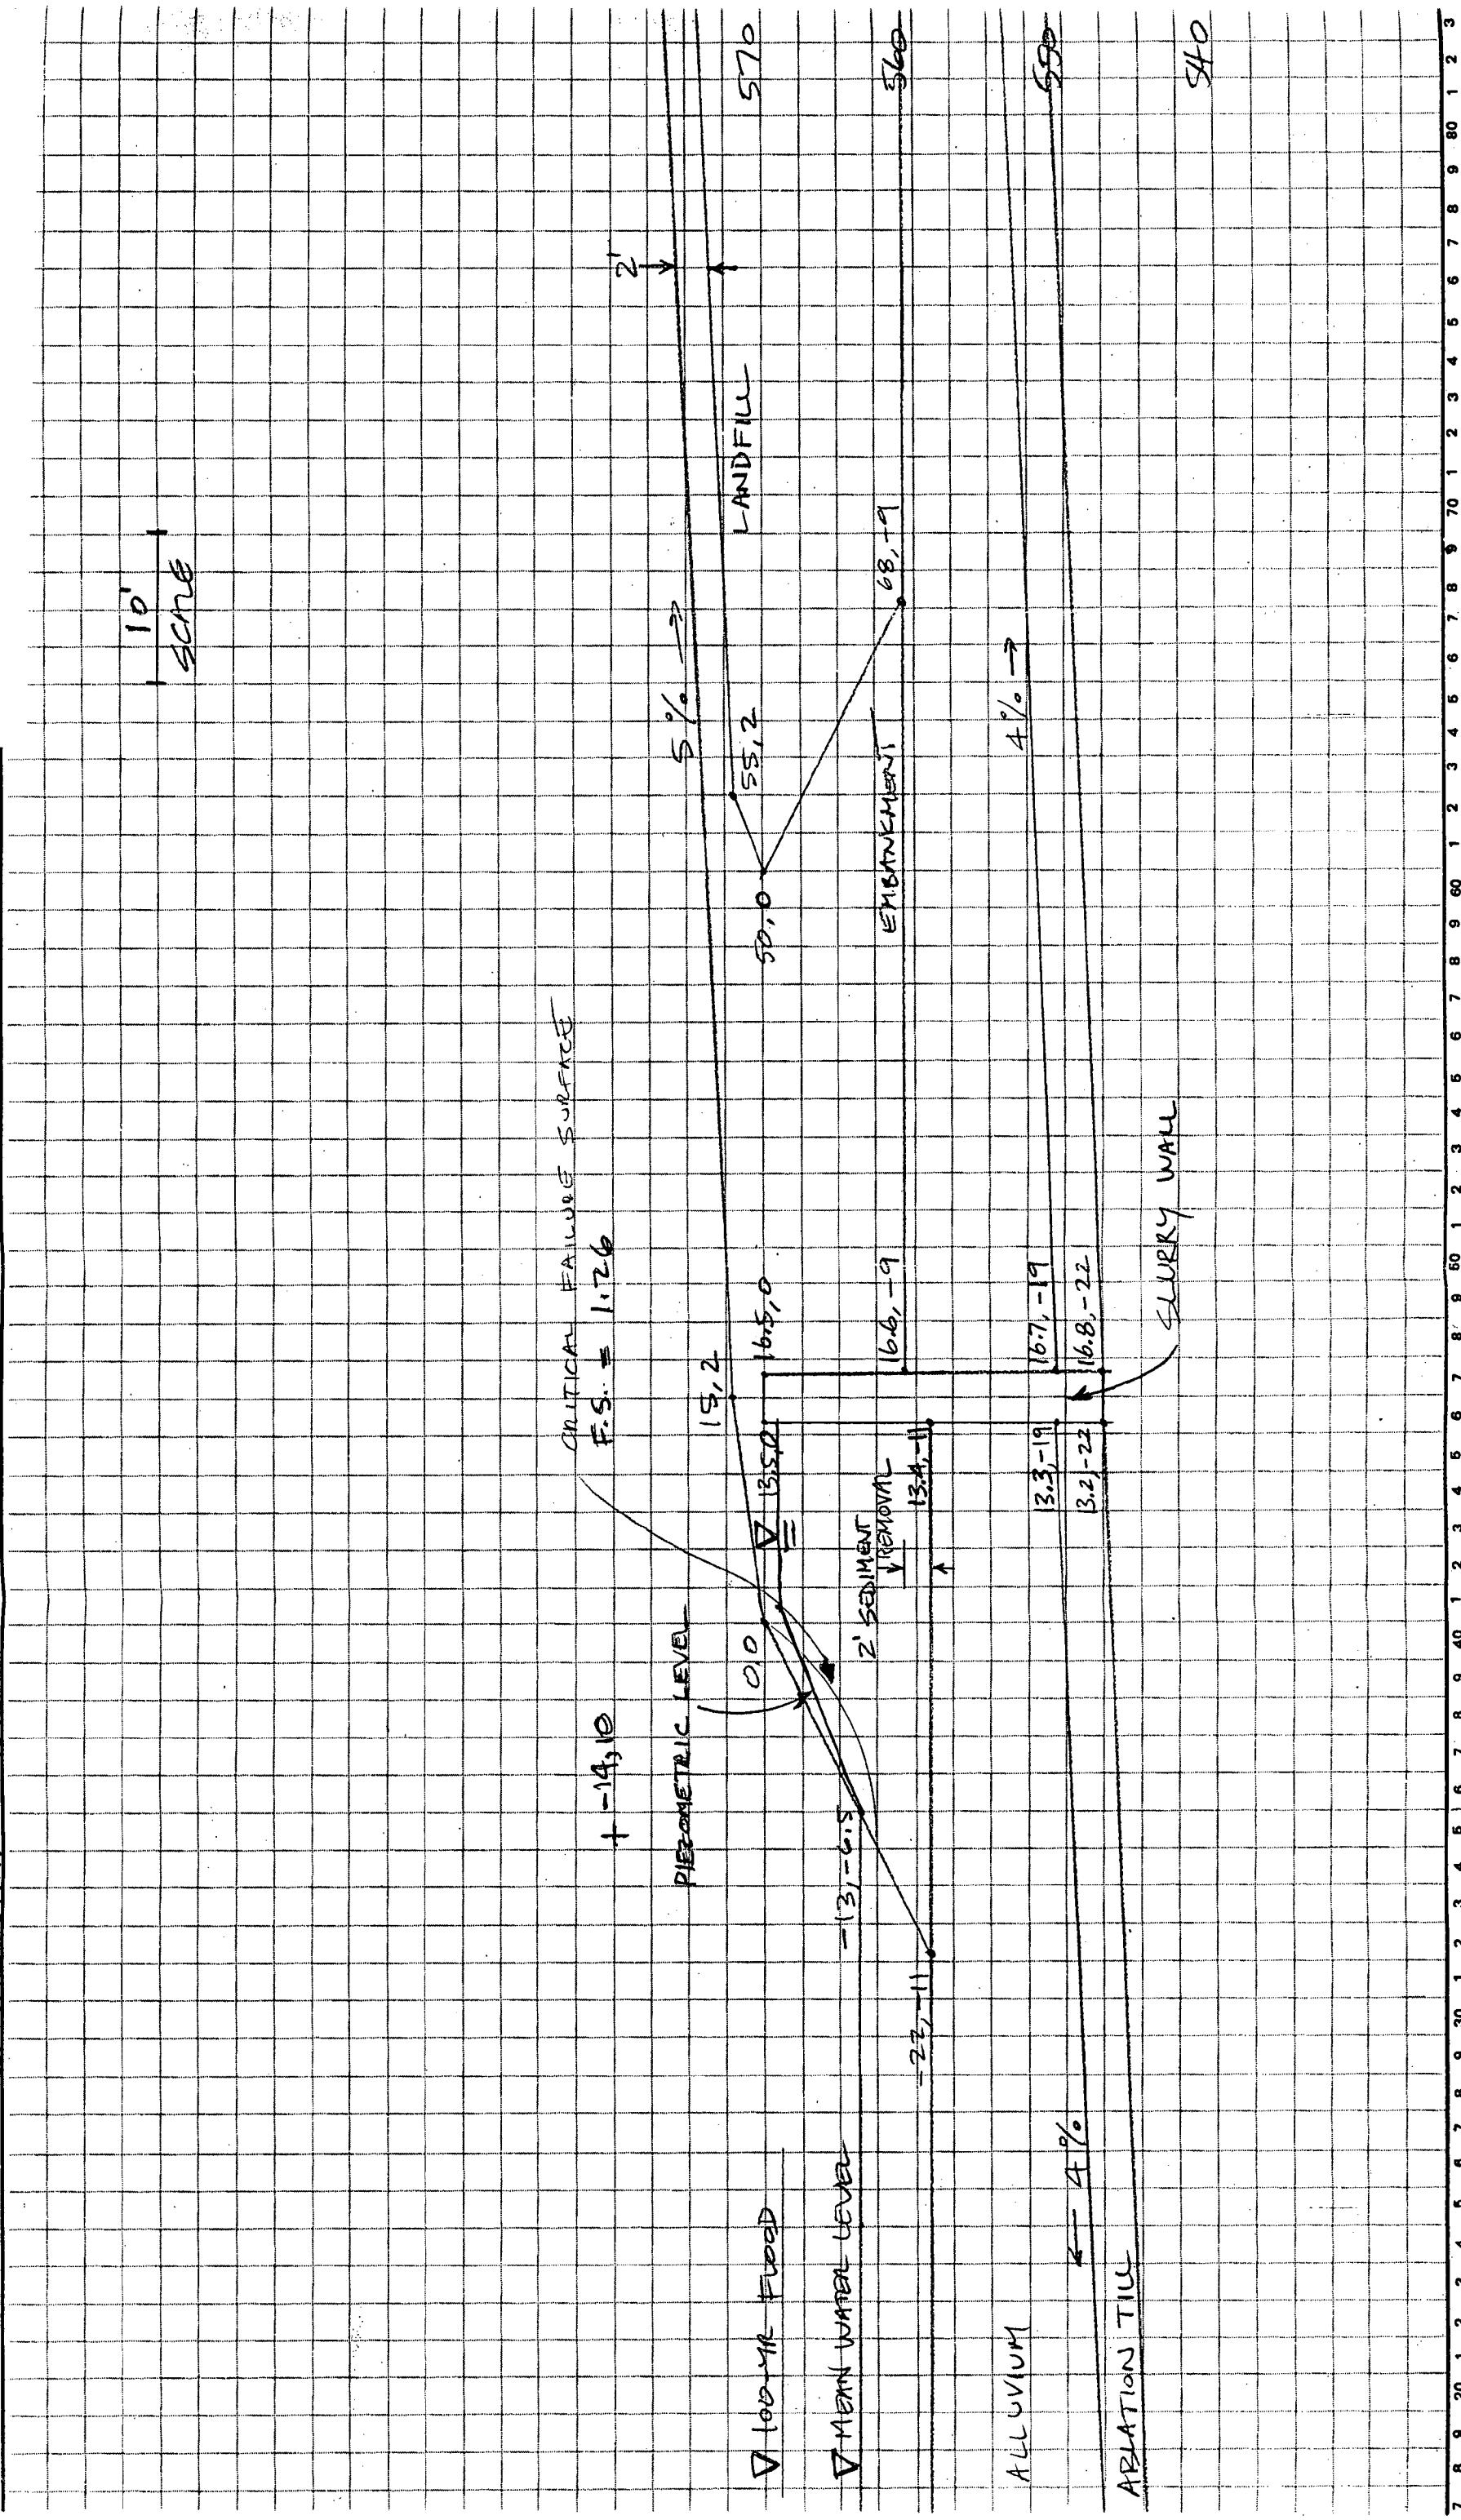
BULKHEAD, OLIN PROPERTY, CROSS-SECTION NO. 1
